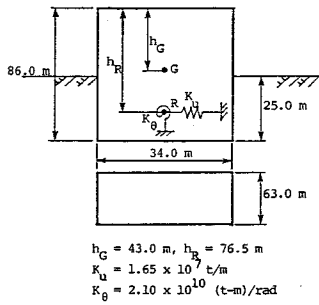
Pier models of Akashi tower in plane of bridge axis.
